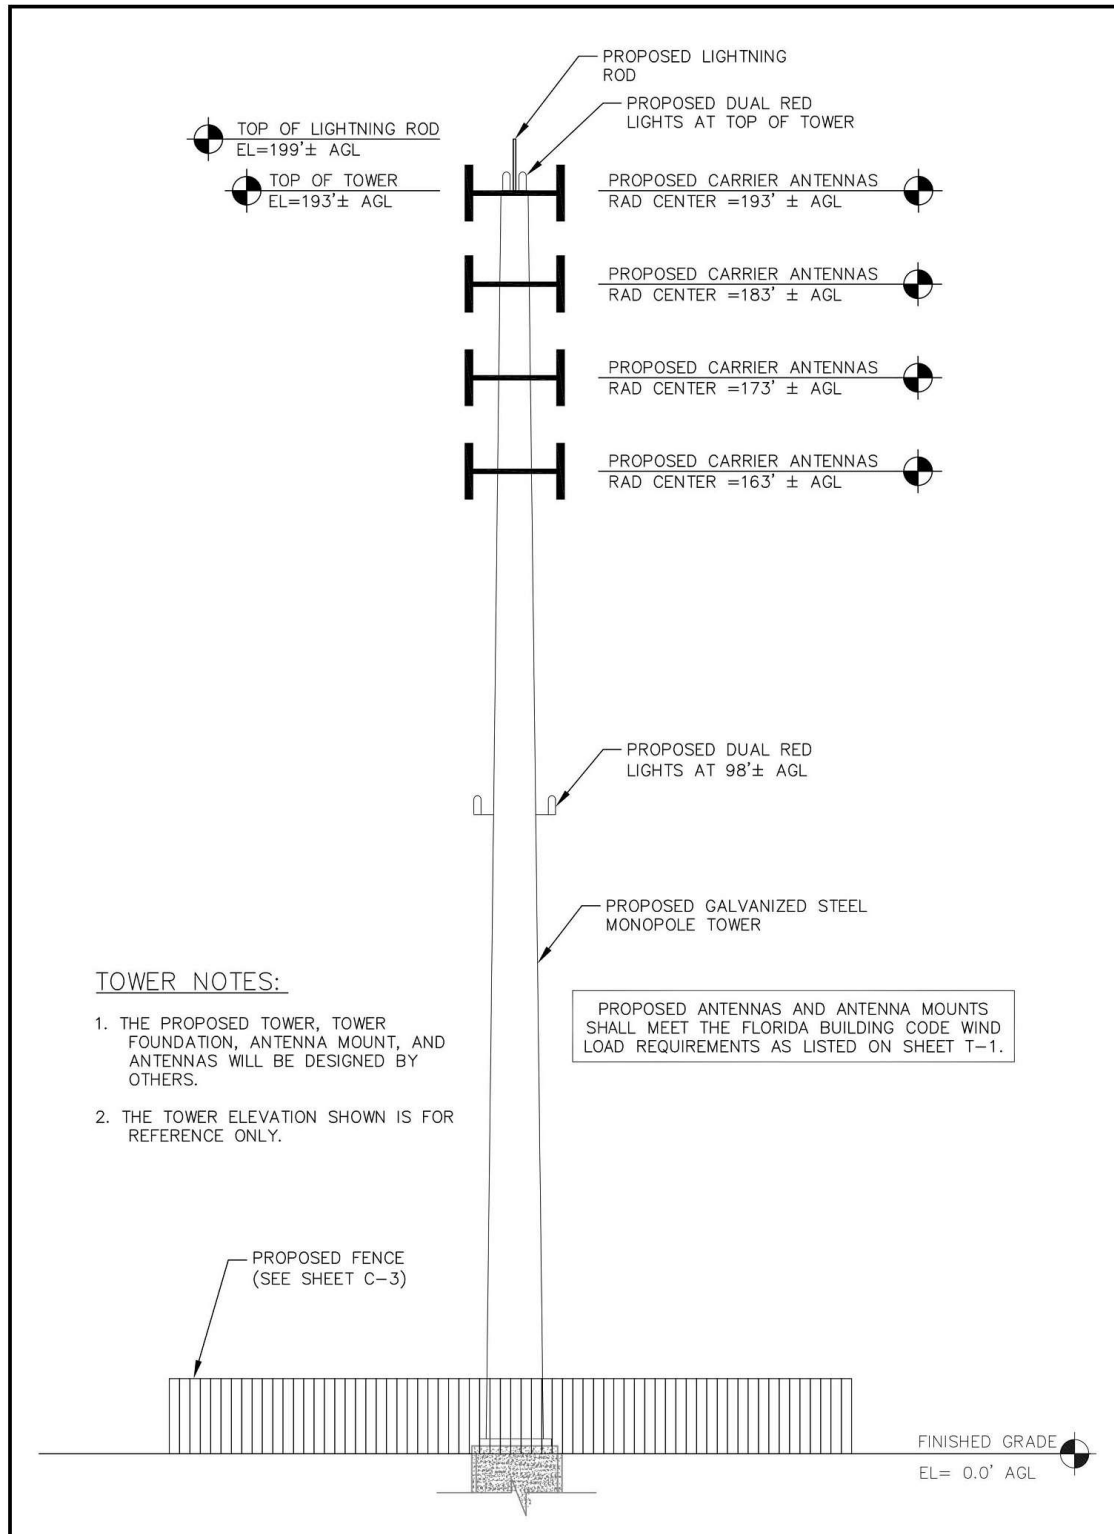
Elevation Sketch of Proposed Monopole Tower
